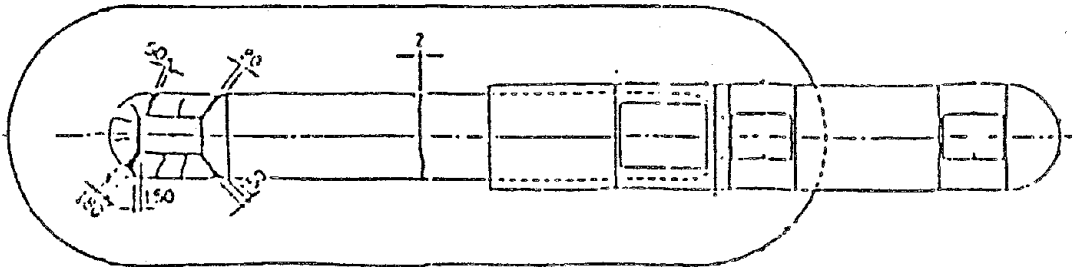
Damage to Pier P-1, the Ten-noh Bridge
